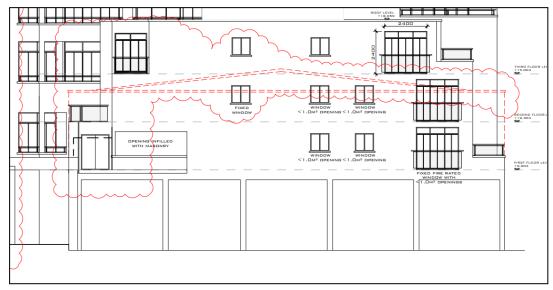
Figure VI - North Elevation showing proposed windows and outline of existing building (edged red)
